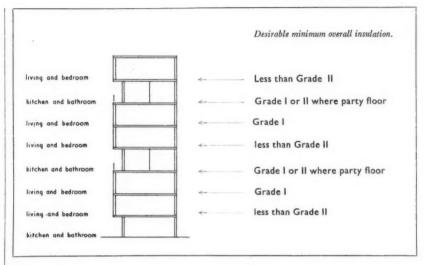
Diagram showing desirable minimum overall insulation applied to the section of a typical block of maisonettes.
